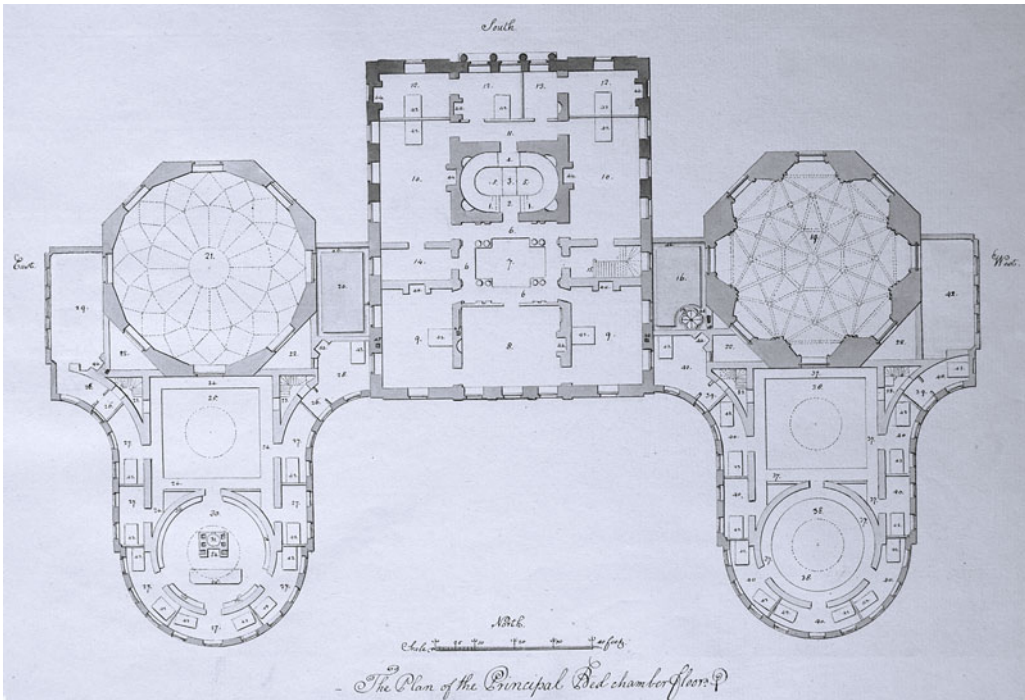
John Carter, plan of the first floor of Bywell Hall. Walls of Paine's house in black. *Photograph: author.
